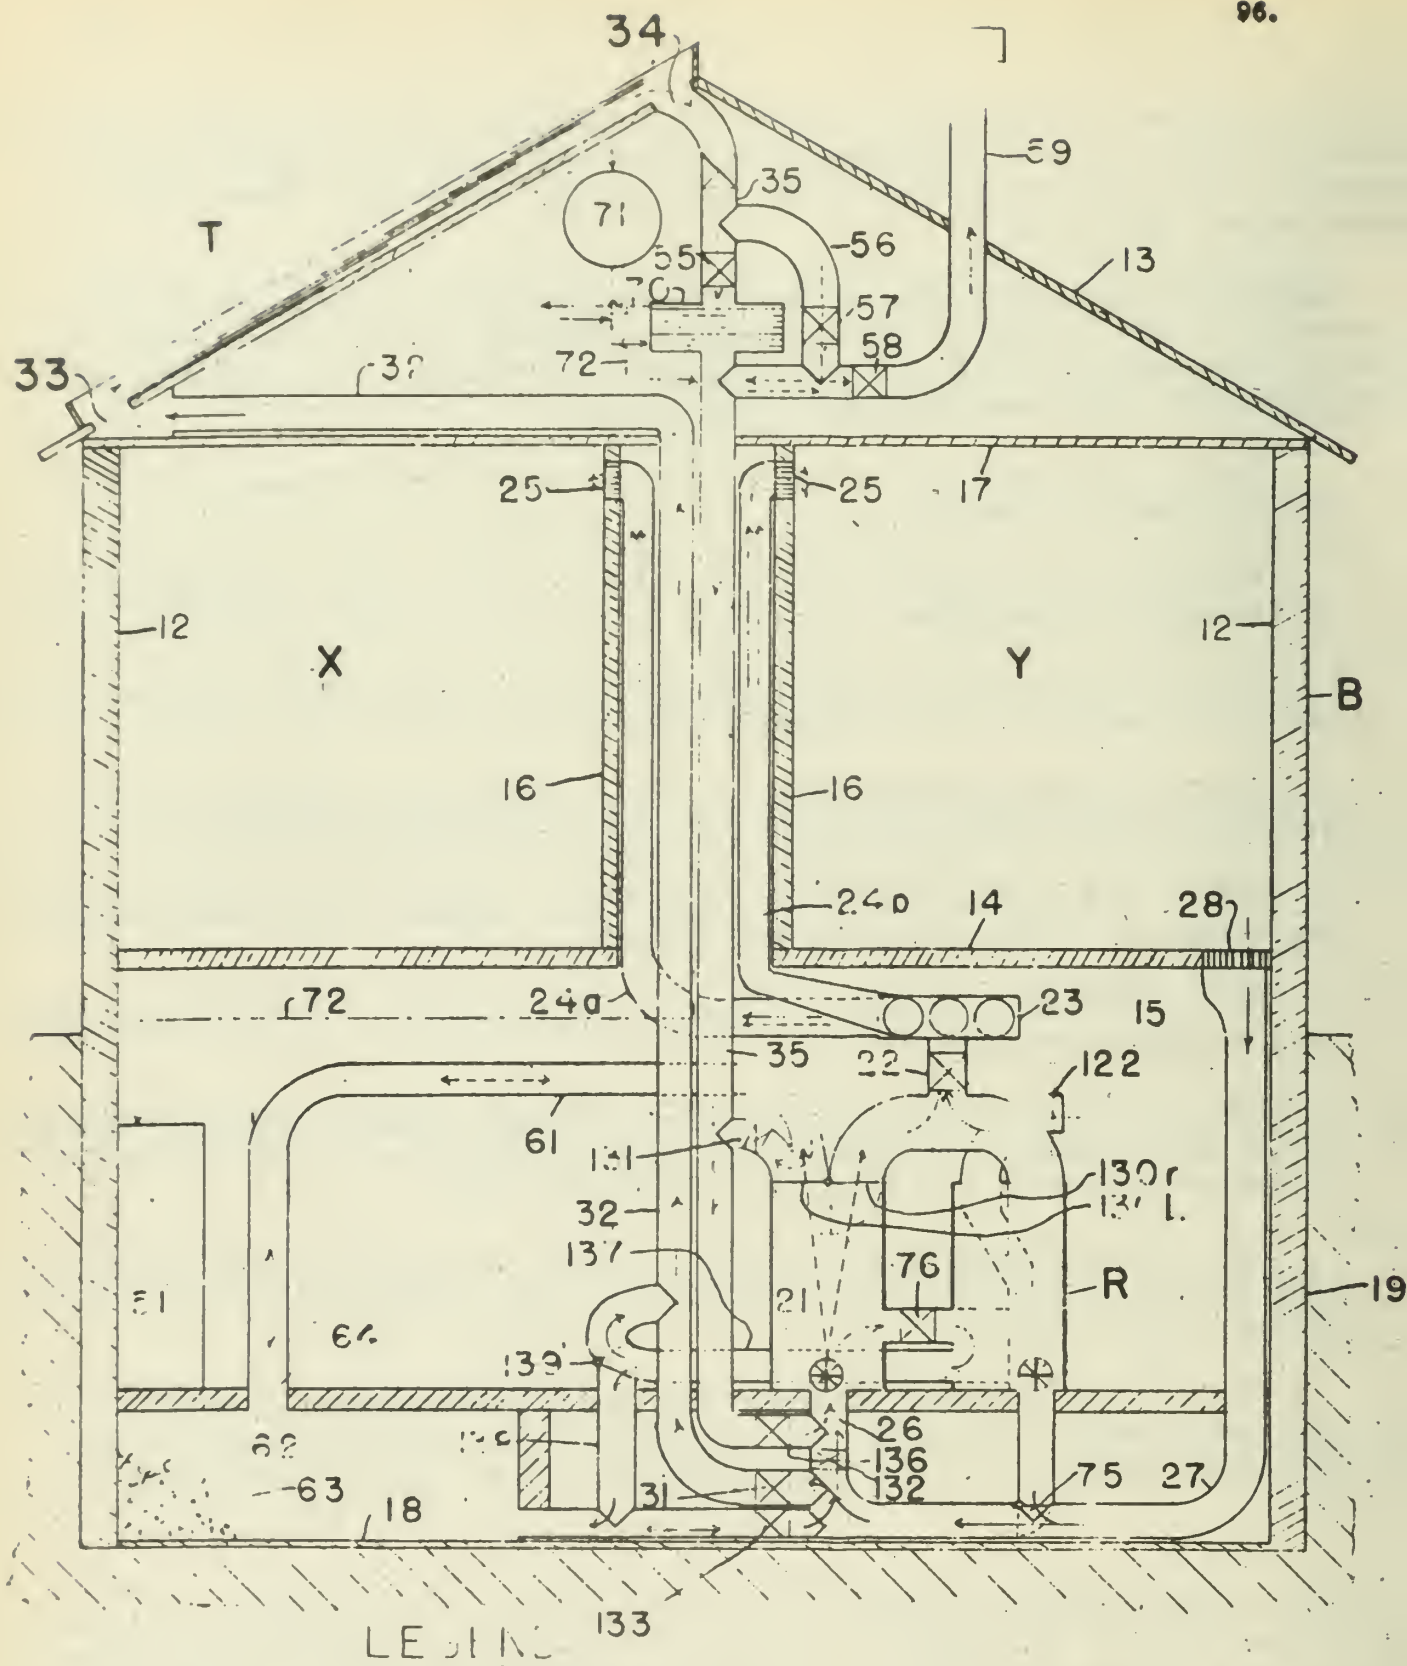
is a similar section illustrating a preferred installation built as a prefabricated unit;
